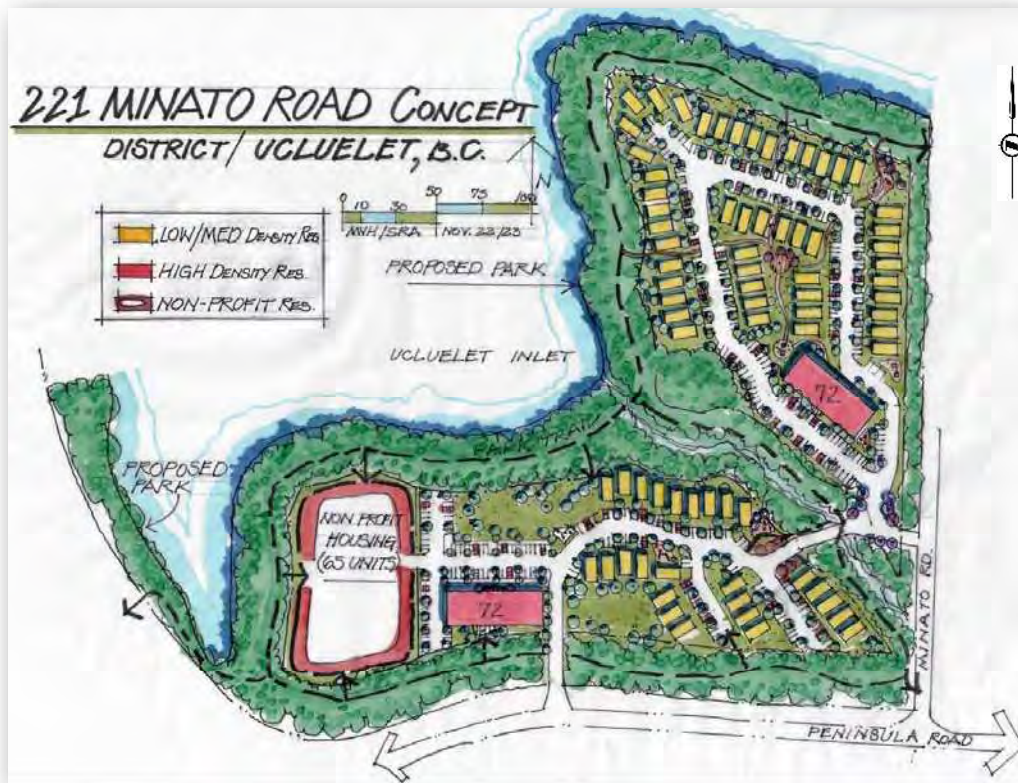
Proposed Development Conceptual Site Plan (provided by District Group)
